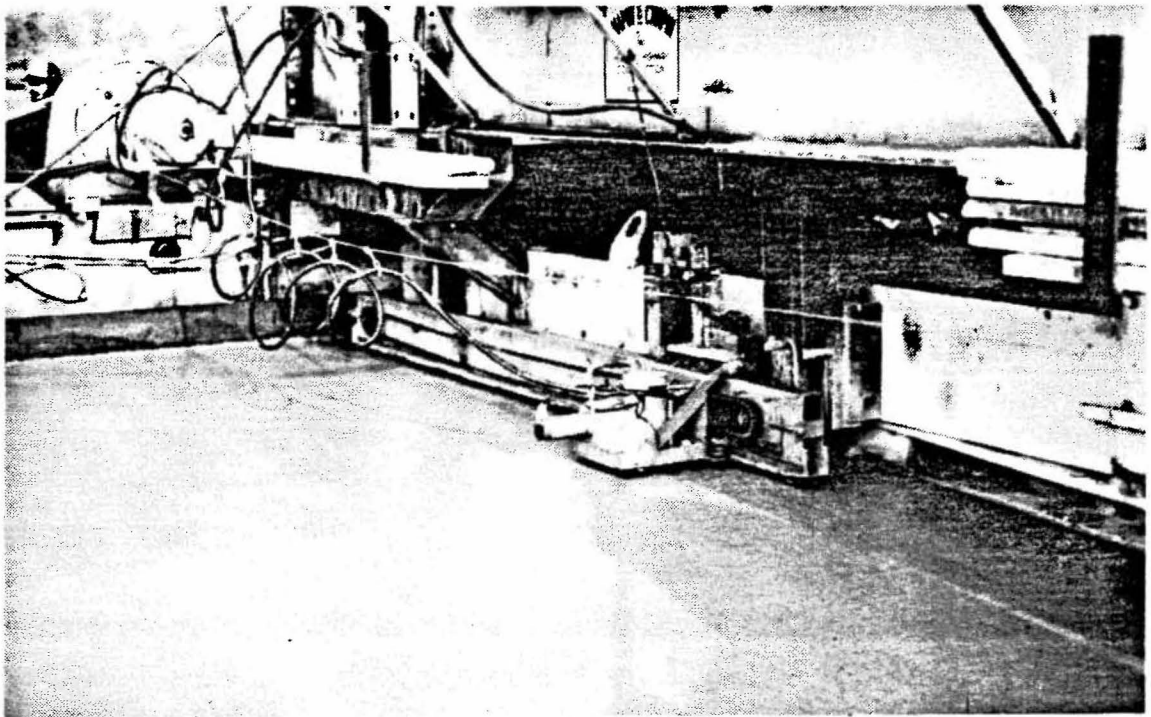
CMD and traversing mechanism mounted behind paving machine.
